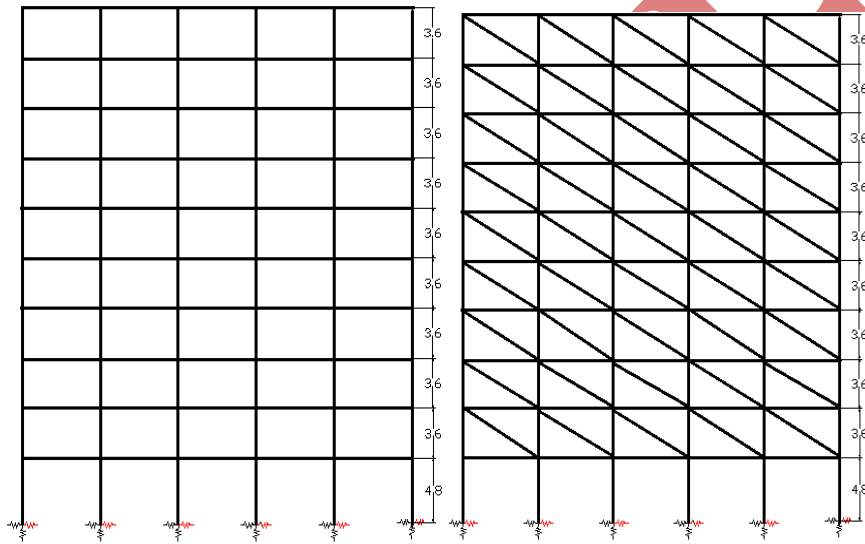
Elevation of ten storeyed brick infill and bare frame buildings with spring supports
